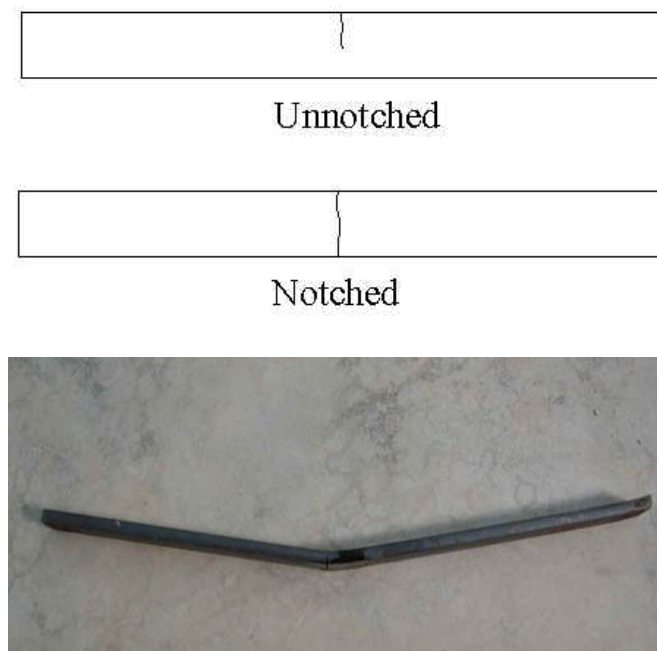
Cracks and fracture in the fatigue tests.
